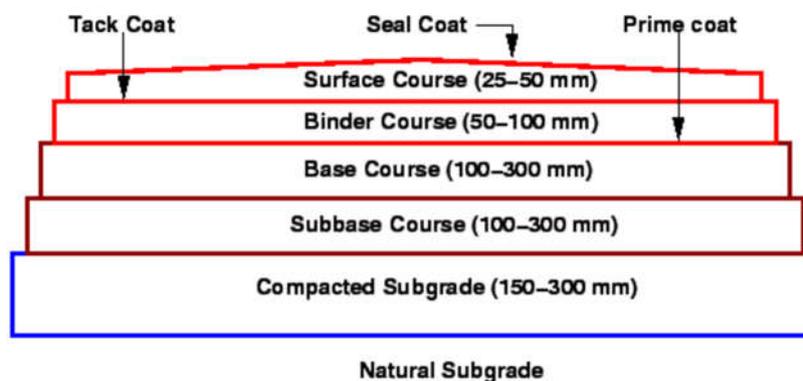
Typical cross section of a flexible pavement showing surface course, binder course, base course, sub-base, and subgrade (Source: IIT Bombay Civil Engineering, 2025).
